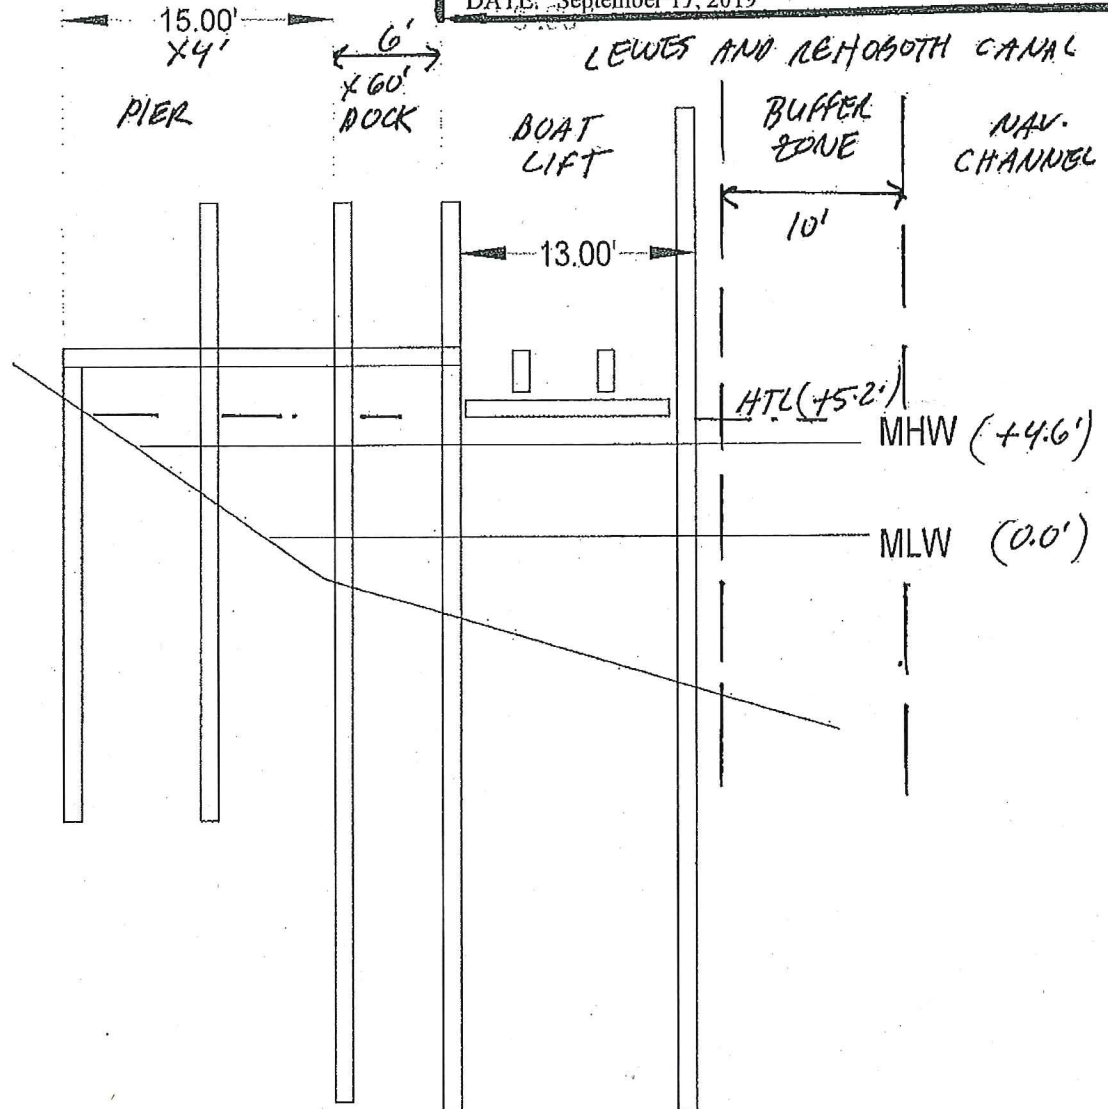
Cross-section of proposed pier, dock and boat lift (prepared by Precision Marine Construction, Inc.).
